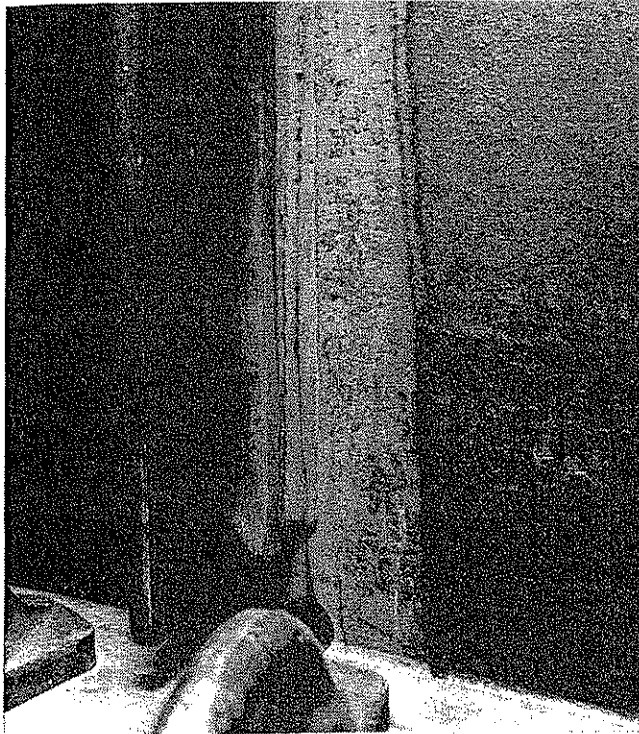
Fatigue crack originating on far side stiffener weld toe of girder 2N.
